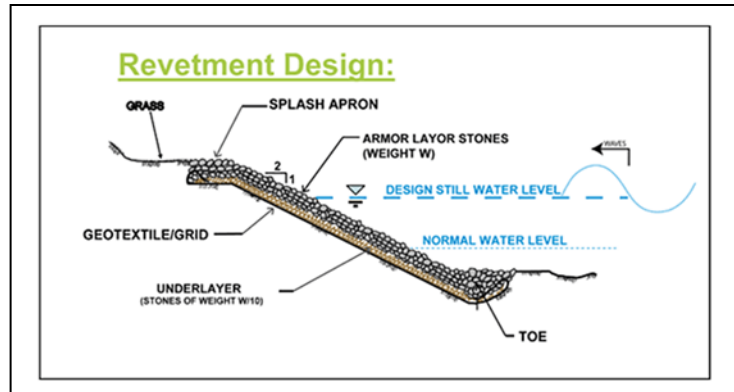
Typical cross-section of revetment after FHWA guidelines.
